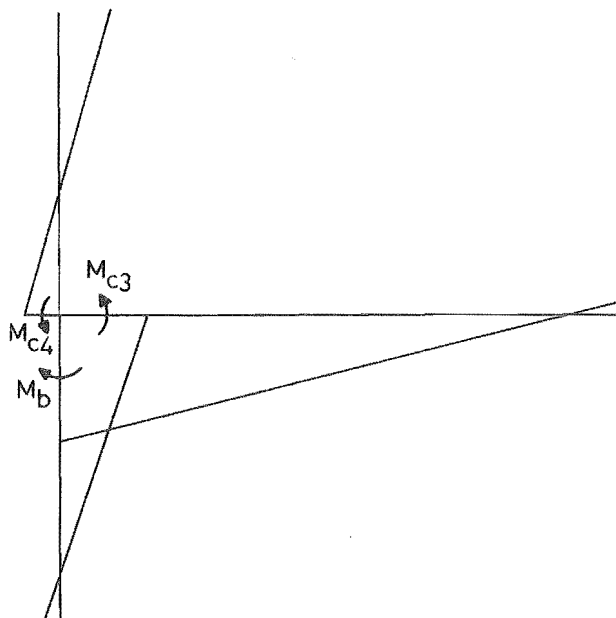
MOMENTS IN MEMBERS FRAMING INTO A TYPICAL EXTERIOR JOINT (THIRD FLOOR) DUE TO LATERAL LOADING
